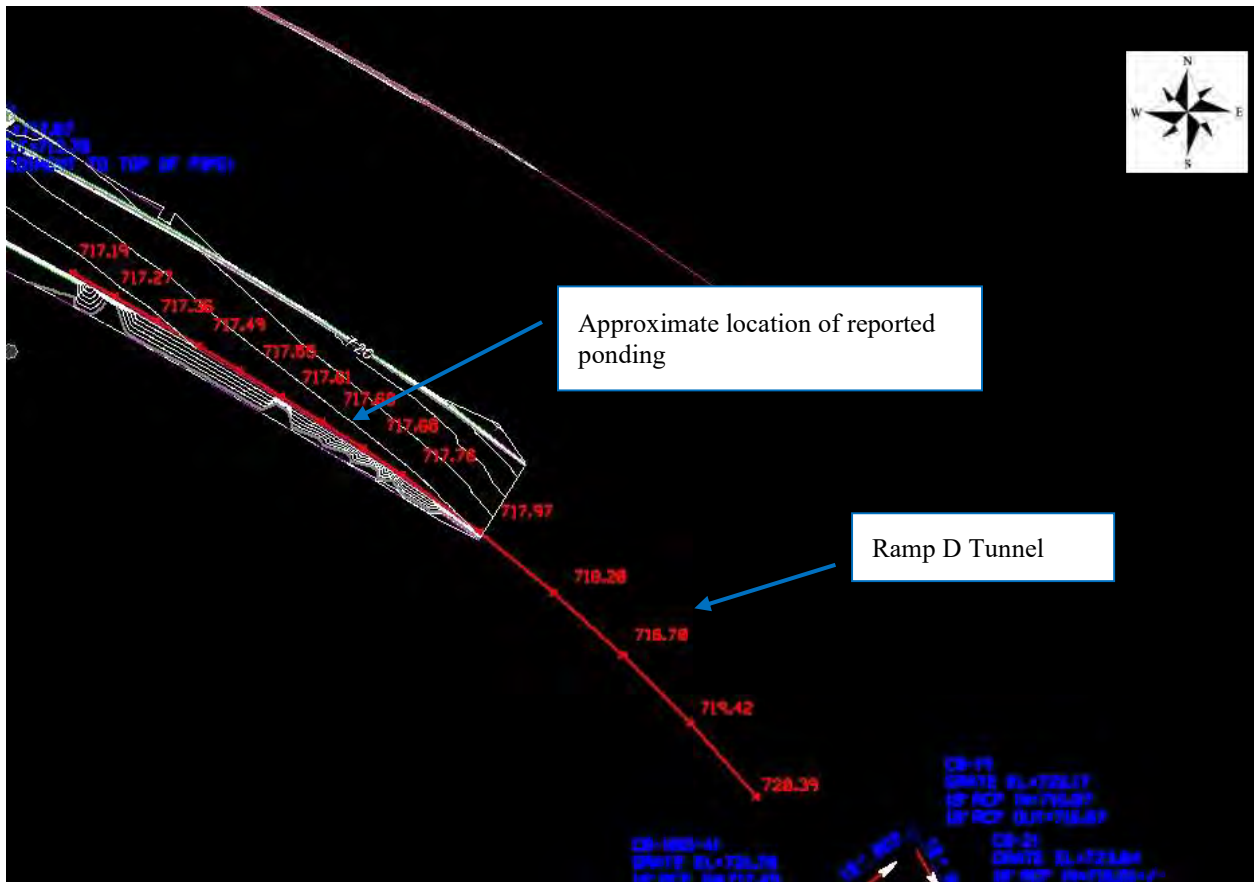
Spot Elevations Along Ramp D and the Ramp D Tunnel
